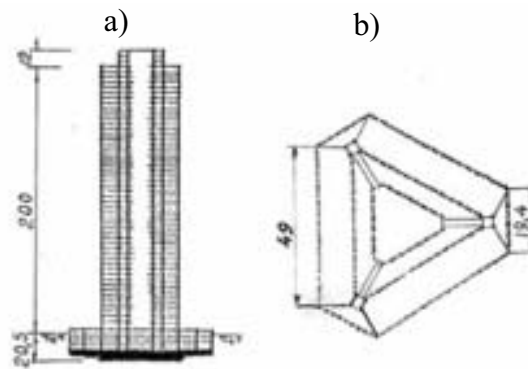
The Administrative building in Tokio: a) vertical section, b) plan.
